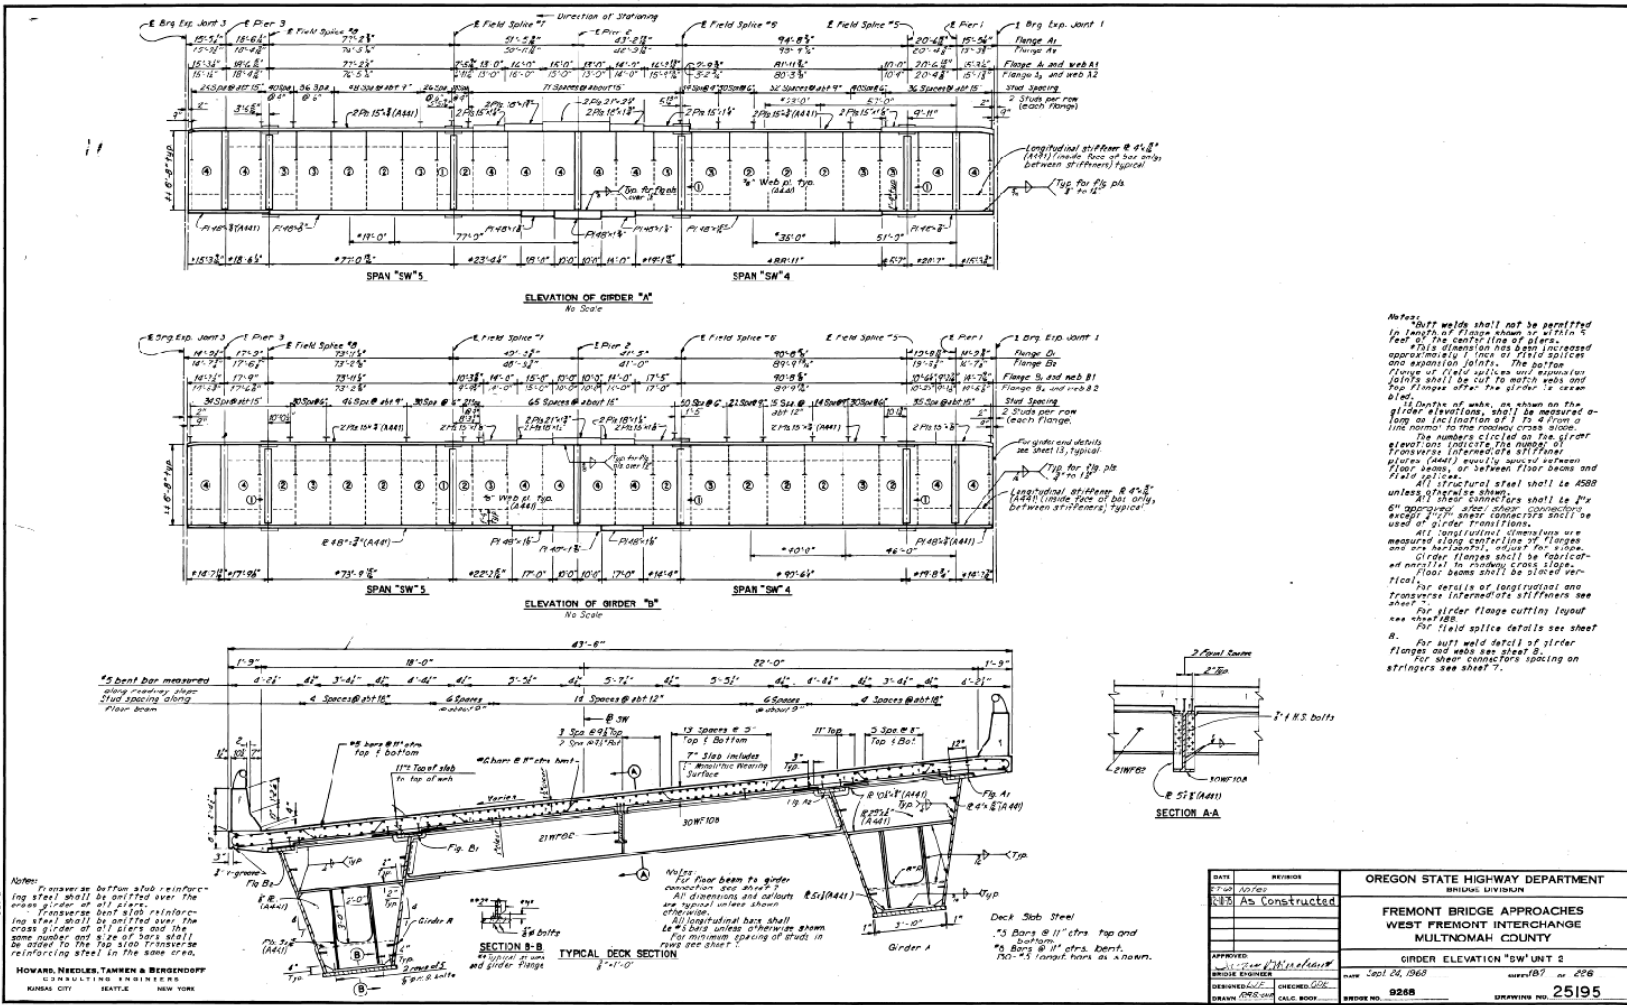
Structural details of SW Unit 2 Bridge superstructure 09268A.
